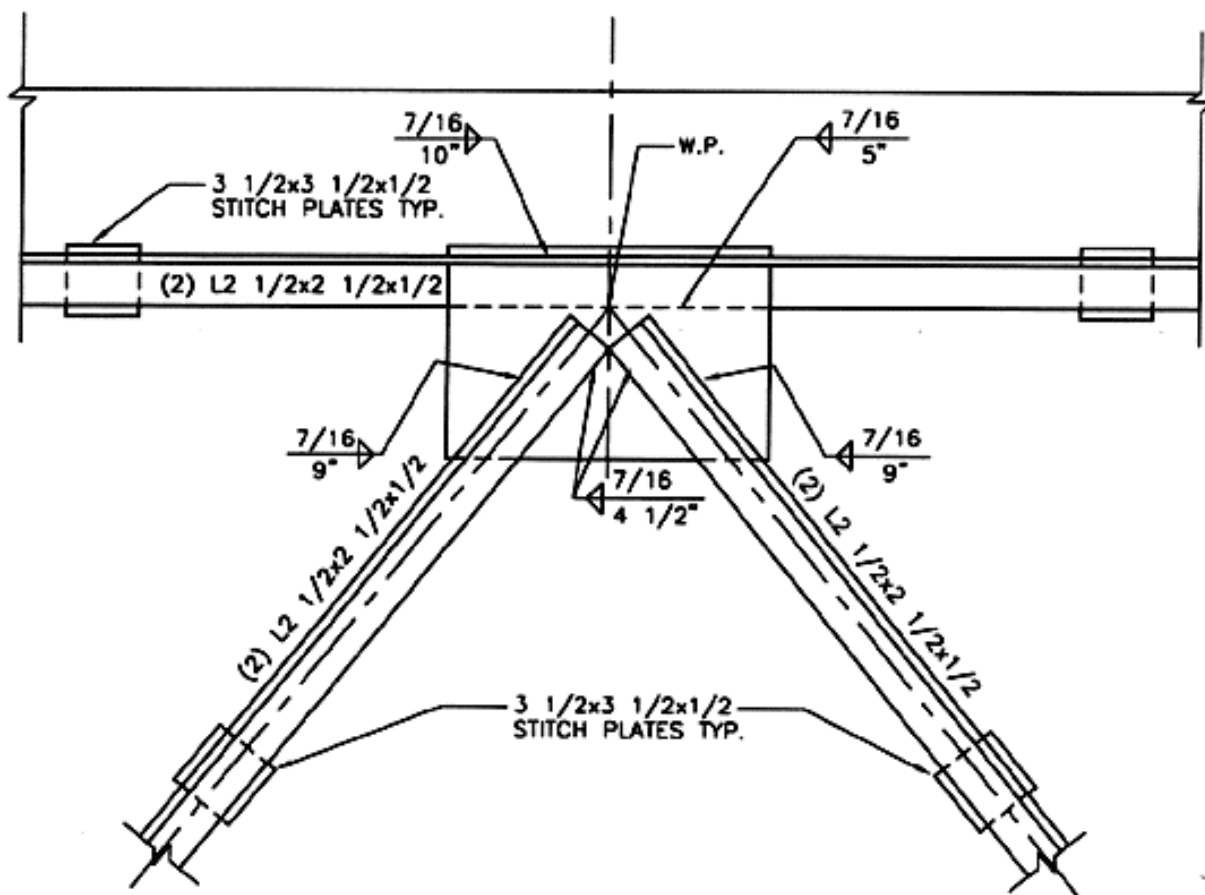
Connection details between diagonal members and top strut at bent cross frame
